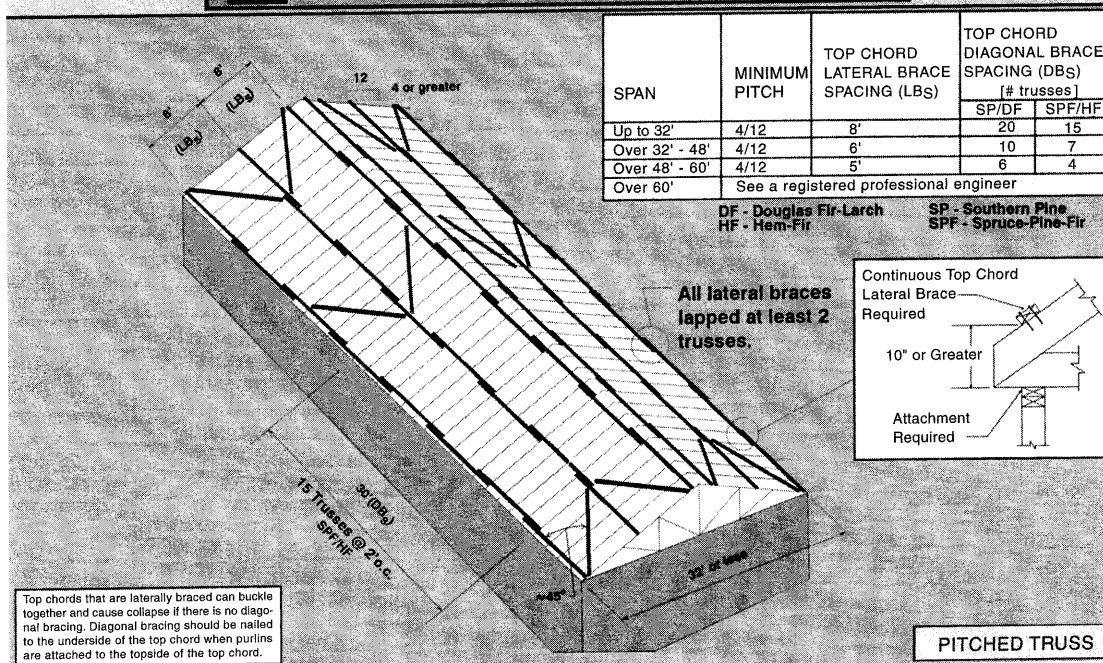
Bracing roof trusses. (Reproduced from HIB-91, courtesy of Truss Plate Institute.)
